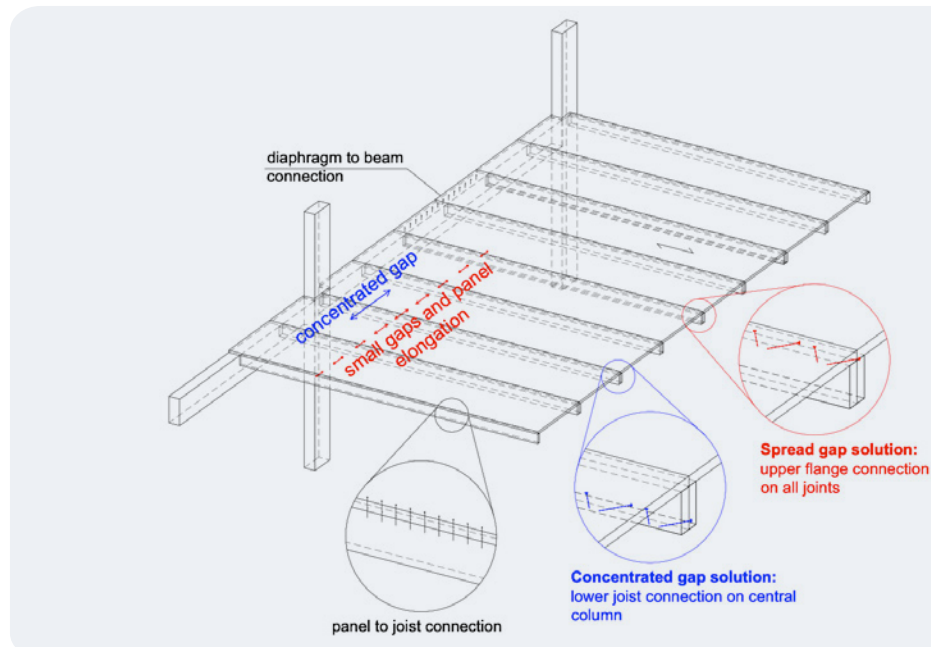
Sample design for a concentrated floor gap (blue) and spread gaps and panel elongation (red). Solutions for a timber-only engineered floor.
